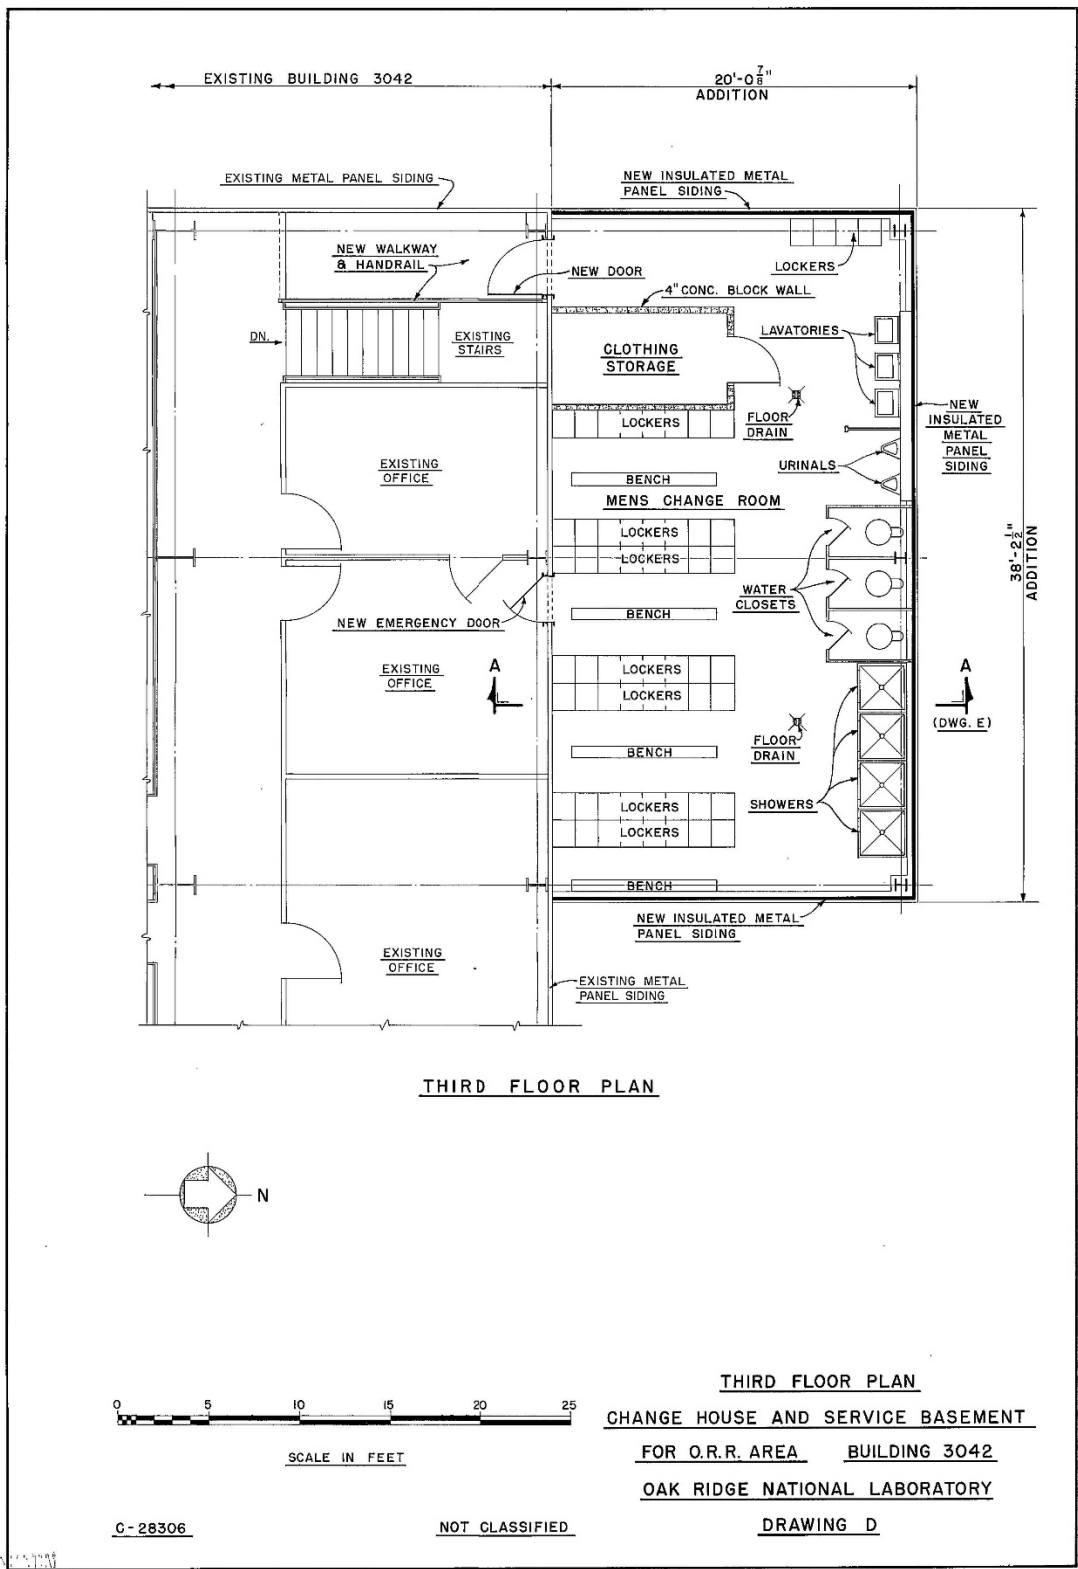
Third floor plan for the circa 1957 Change House and Service Basement addition to the north elevation of Building 3042 (Oak Ridge National Laboratory, n.d.).
